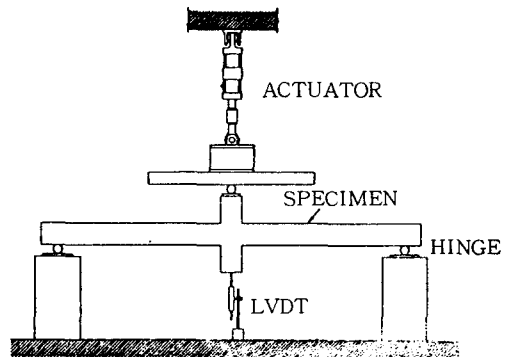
Test set-up of Half Slab - wall joint specimens (CSE60-A, B, CSE70-A, B, C)
